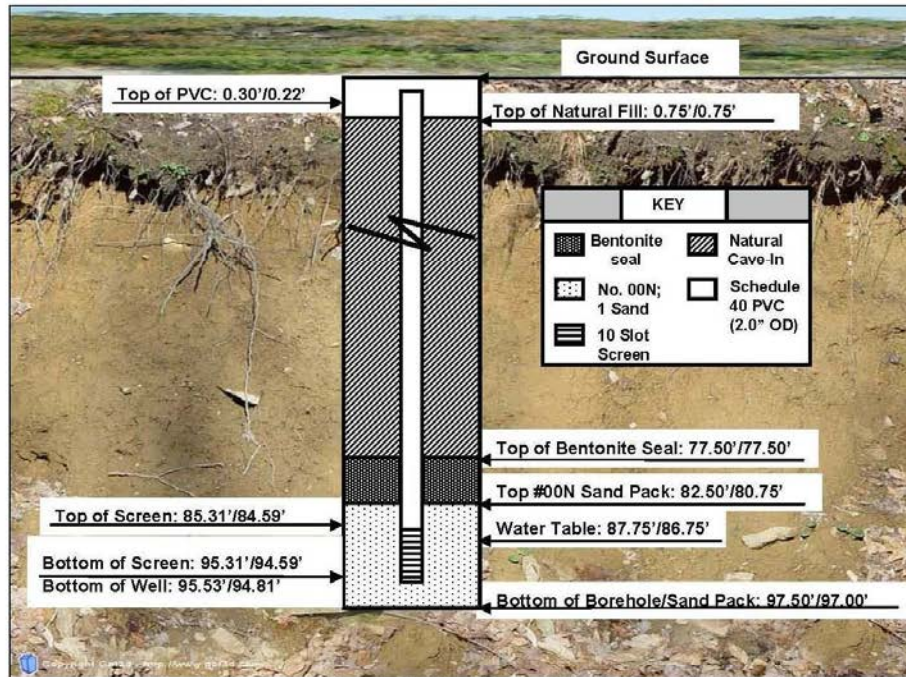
Groundwater Monitoring Well Typical Construction Details
